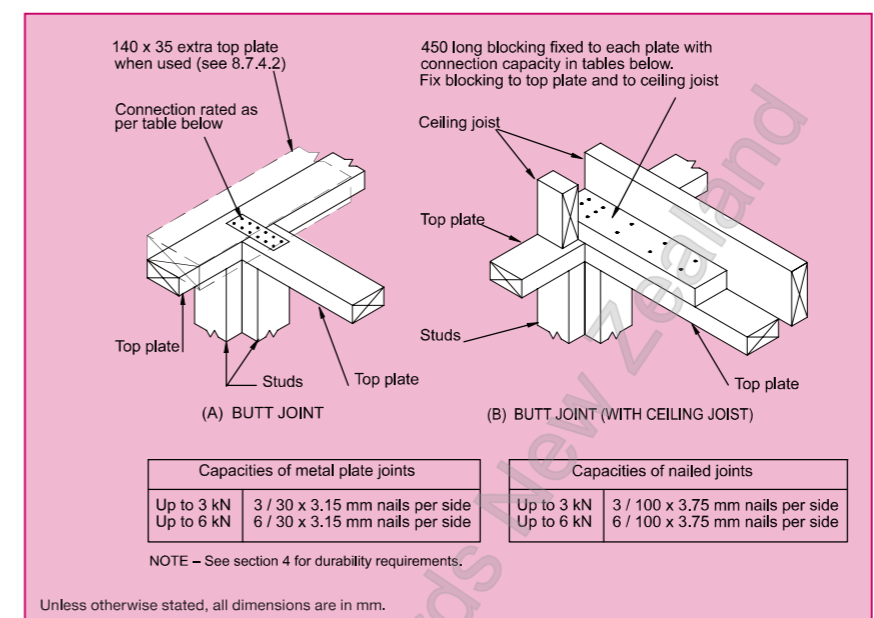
Connecting top plates to external walls at right angles - Walls containing bracing (see 8.7.3.4)
